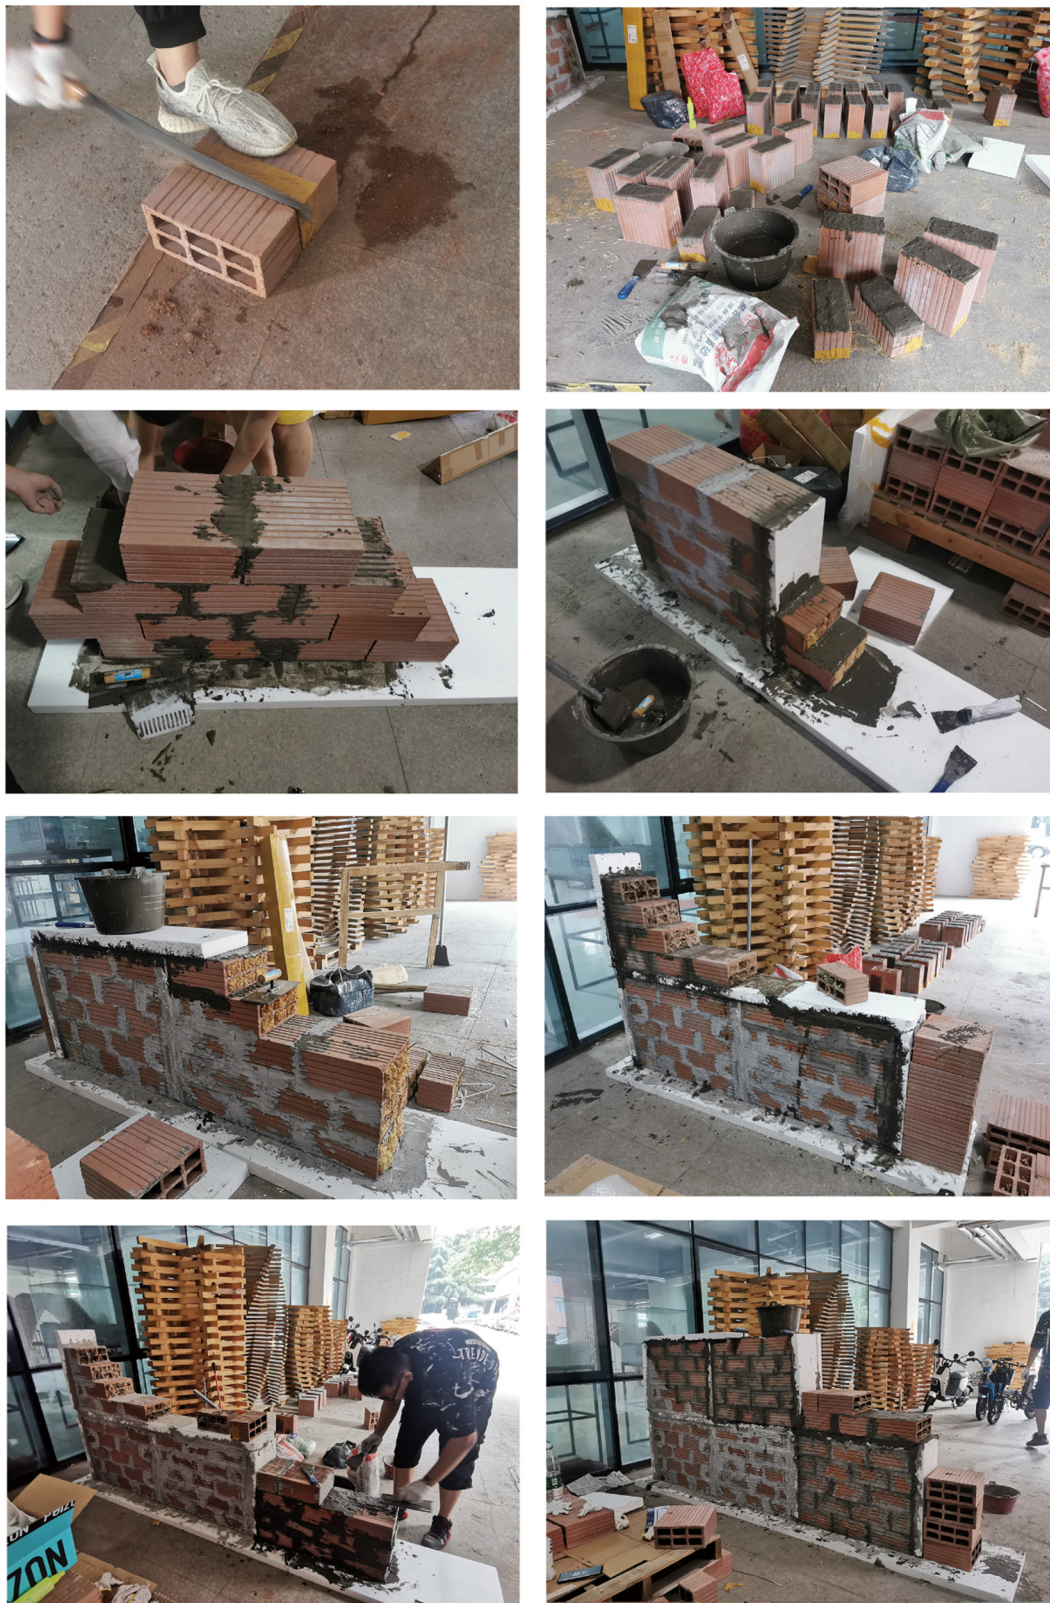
On-site masonry photo of straw hollow bricks wall
